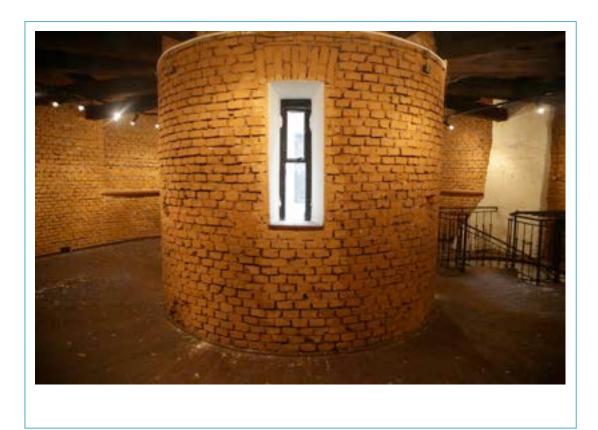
, Ground floor before the conservation, photo by Marta Boguta
